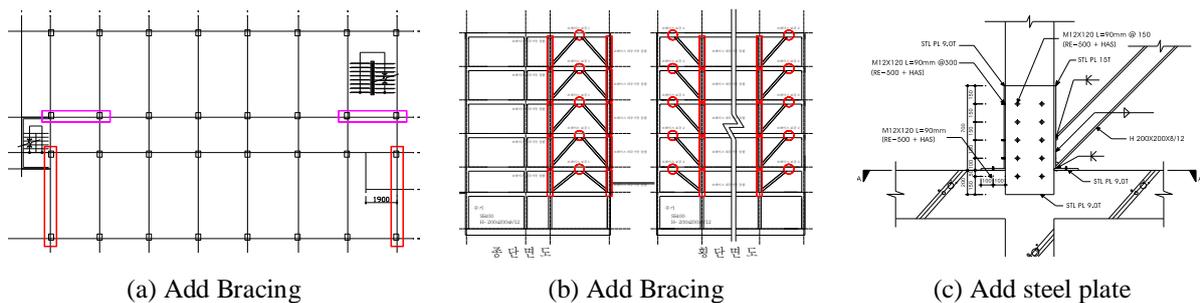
Retrofitting plan for reinforced concrete structure of neighborhood facility
